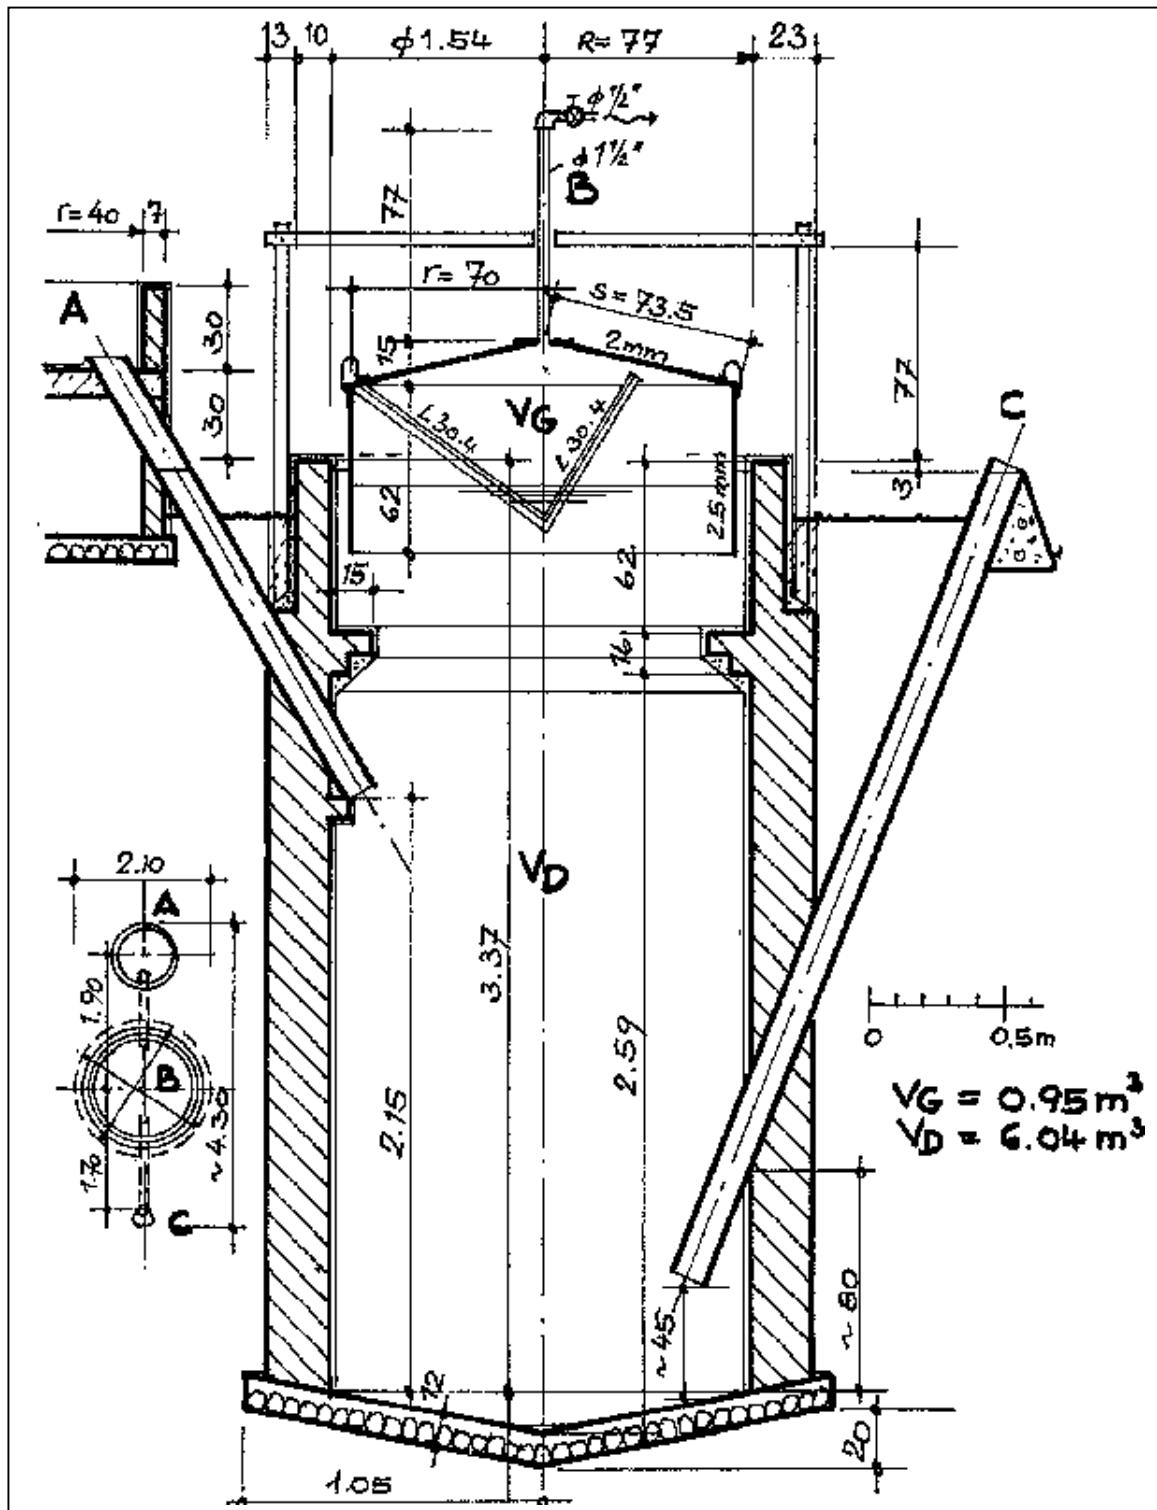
Constructional drawing of a floating-drum plant for quarrystone masonry (vertical plant)
